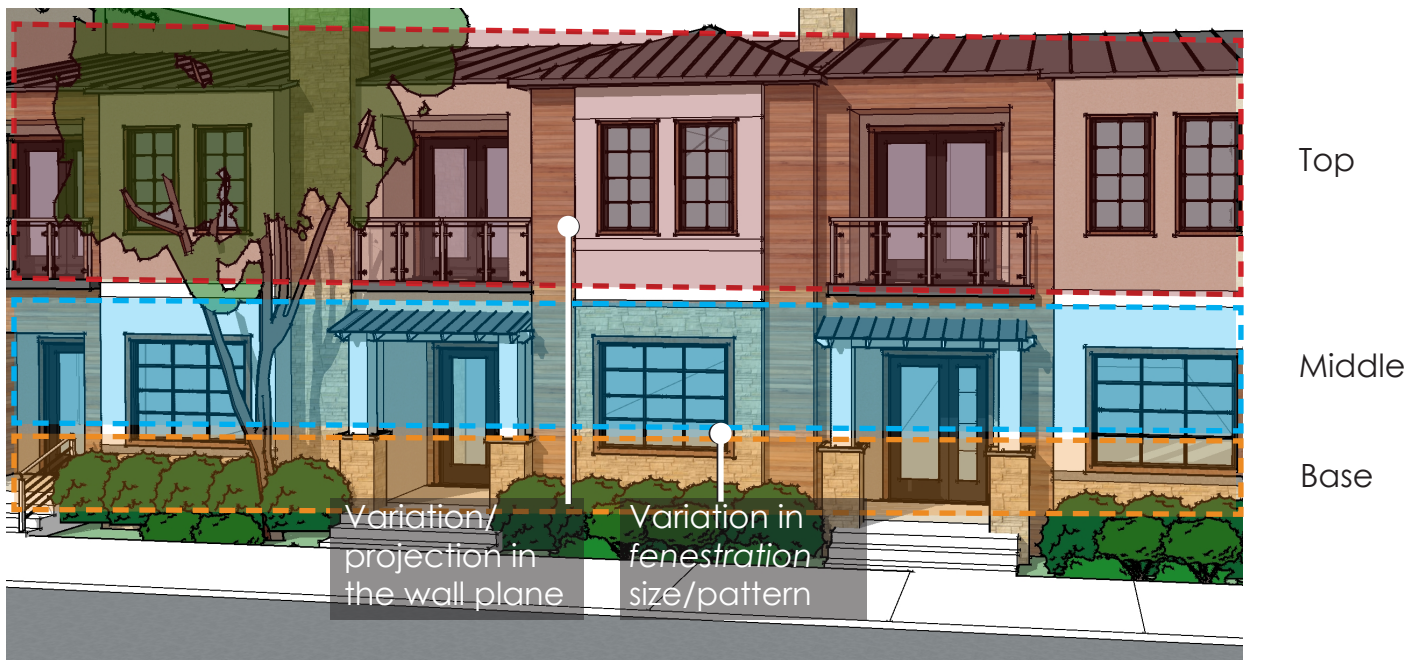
The design of this building provides a defined base, middle, and top, through changes in colors, materials, and a second story projection in the wall plane (3.A.1)
